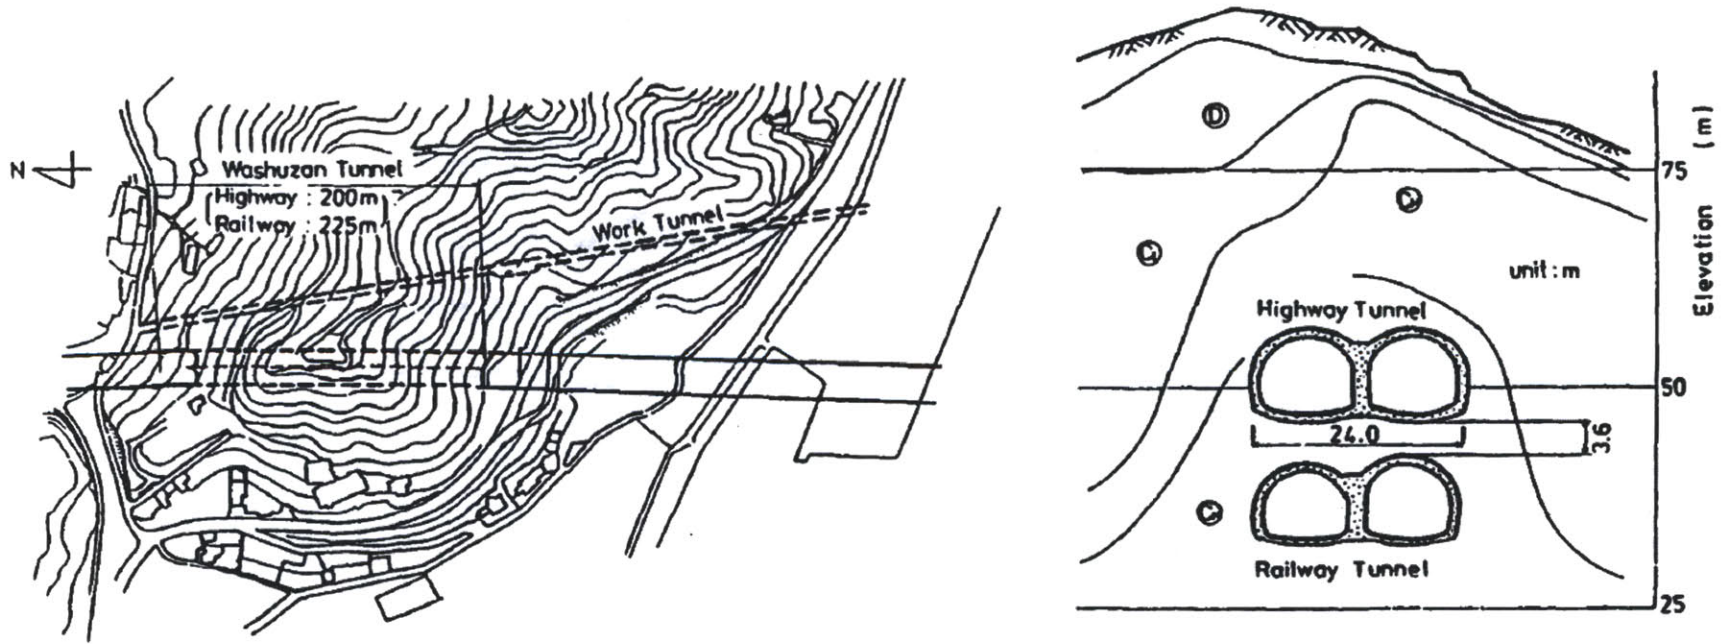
Plan view of tunnel construction site and tunnel cross-section (Gioda and Sakurai, 1987)
